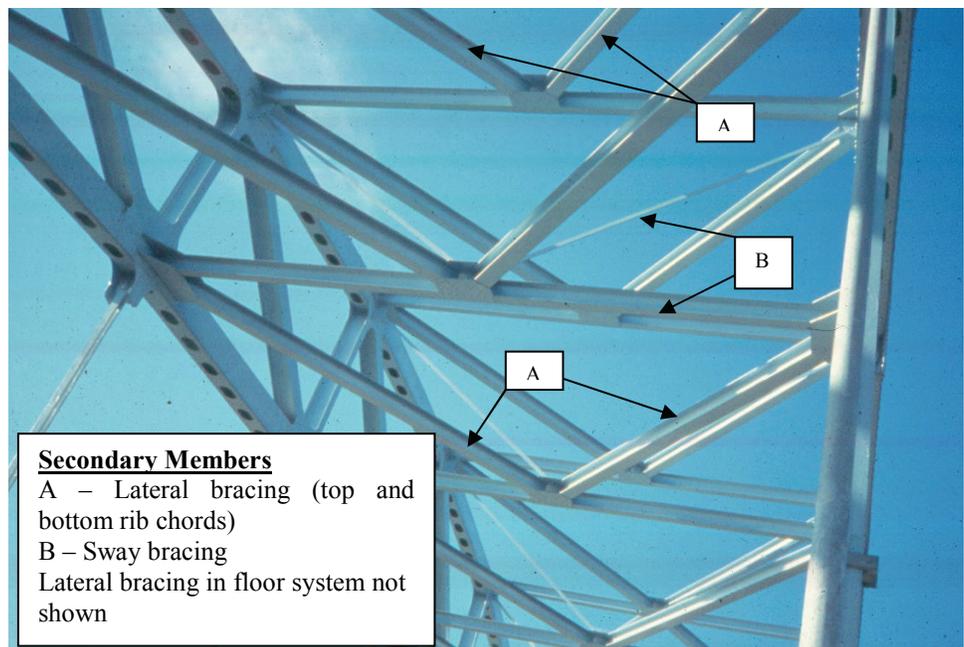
Through Arch Bracing (Secondary Members)
